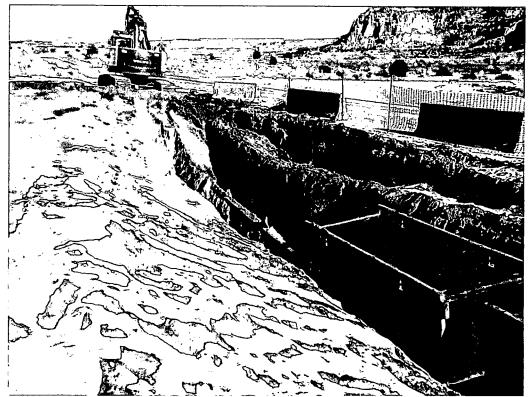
View of the northern section of the excavation. County road along east side of excavation
